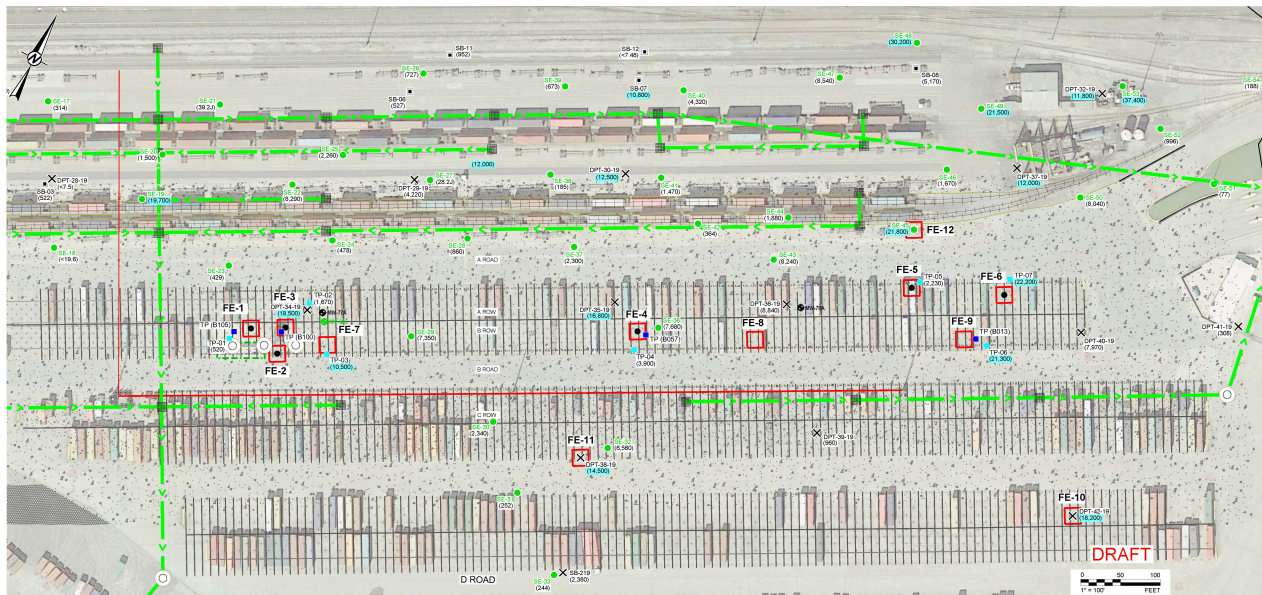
Site Plan for Focused Excavations, Houston Wood Preserving Works, Englewood Intermodal Yard
